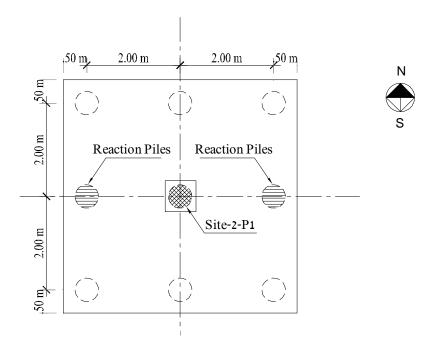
Locations of test pile and reaction piles at Manikganj site
